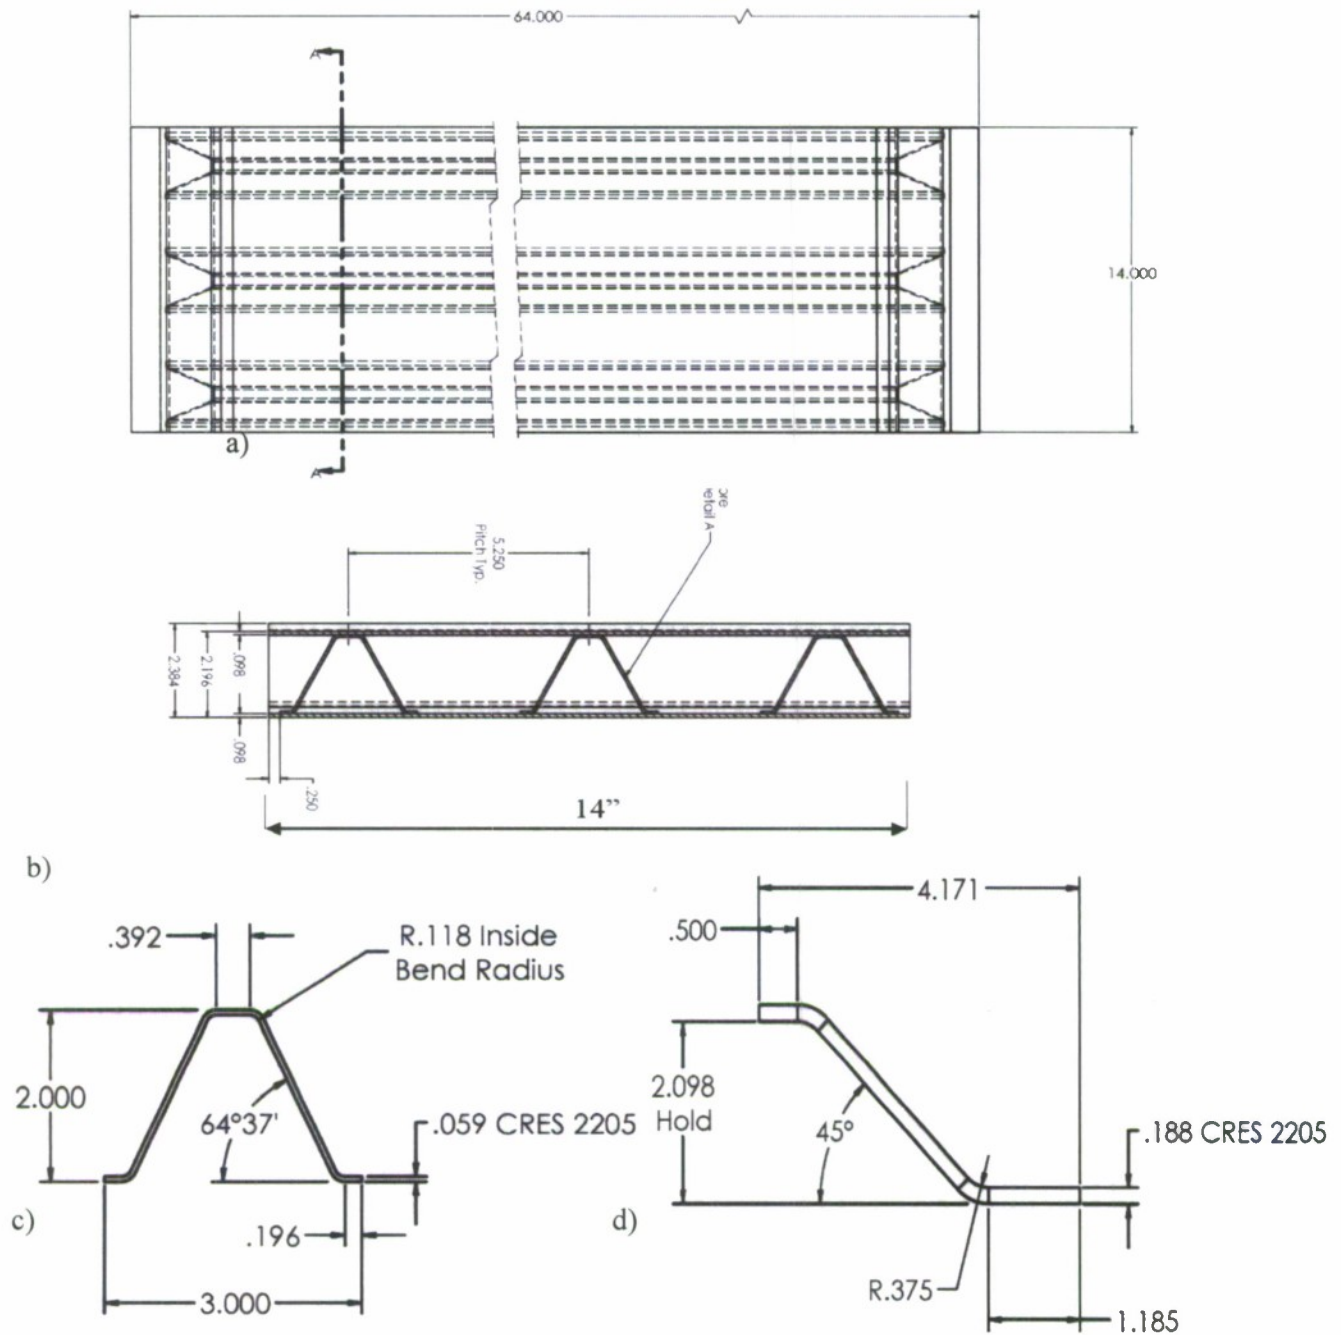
Tapered Connection Test Model a) Plan View; b) Section through cores; c) Prismatic Stiffener Detail; d) Tapered Close Out Detail
